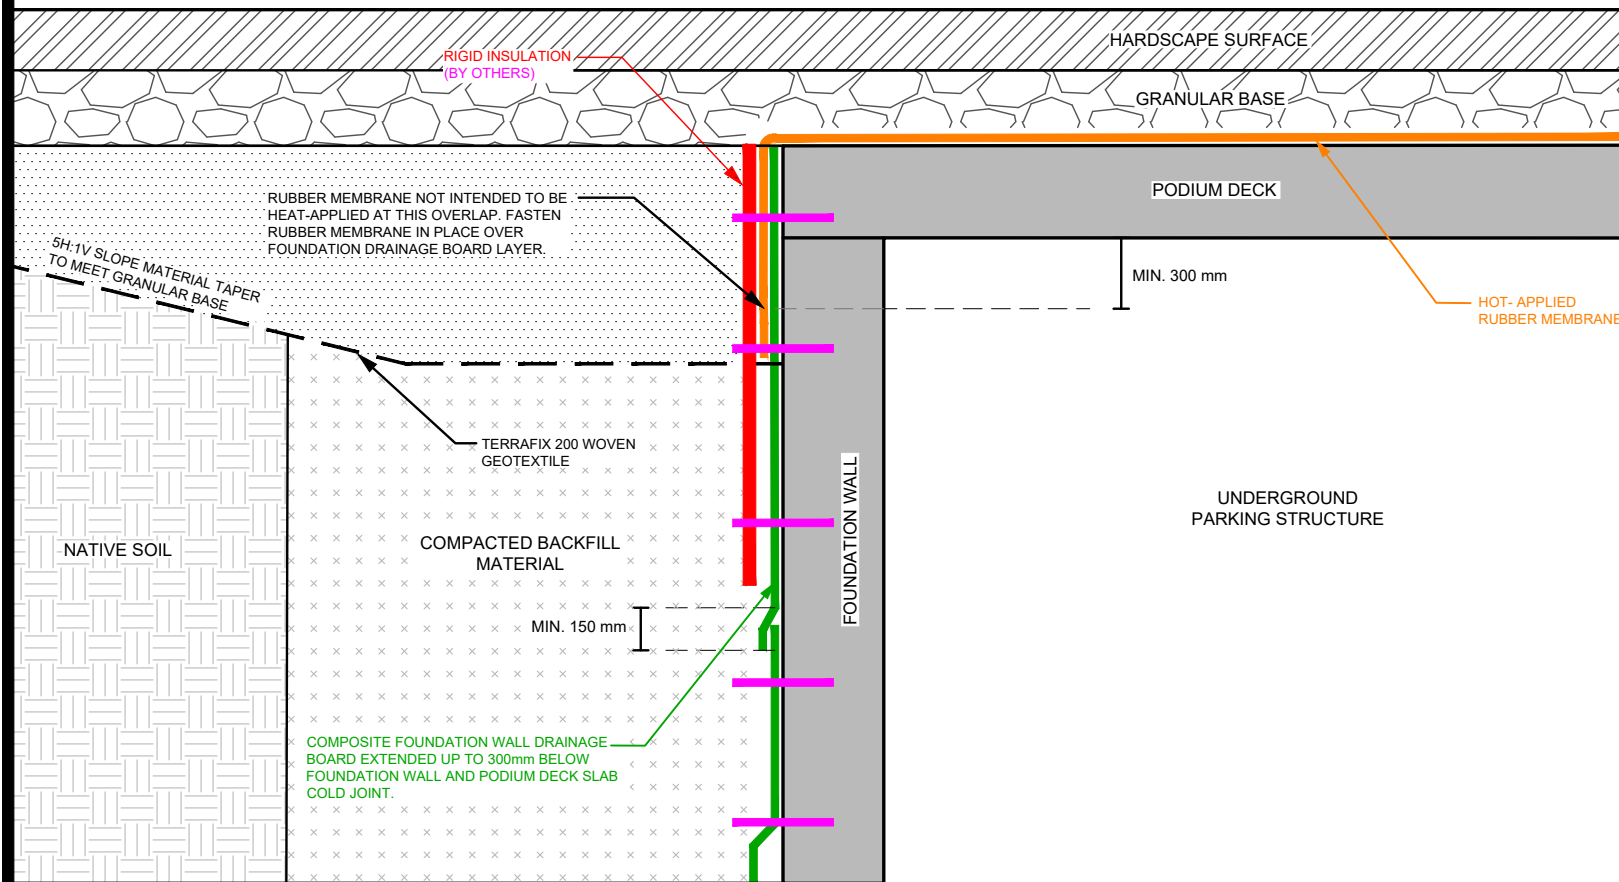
PODIUM DECK TO FOUNDATION WALL DRAINAGE SYSTEM TIE-IN
